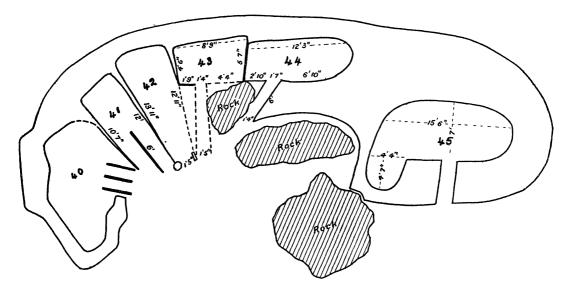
GROUND PLAN OF HOUSES NOS. 40 TO 45, SHOWING CERTAIN MEASUREMENTS.
